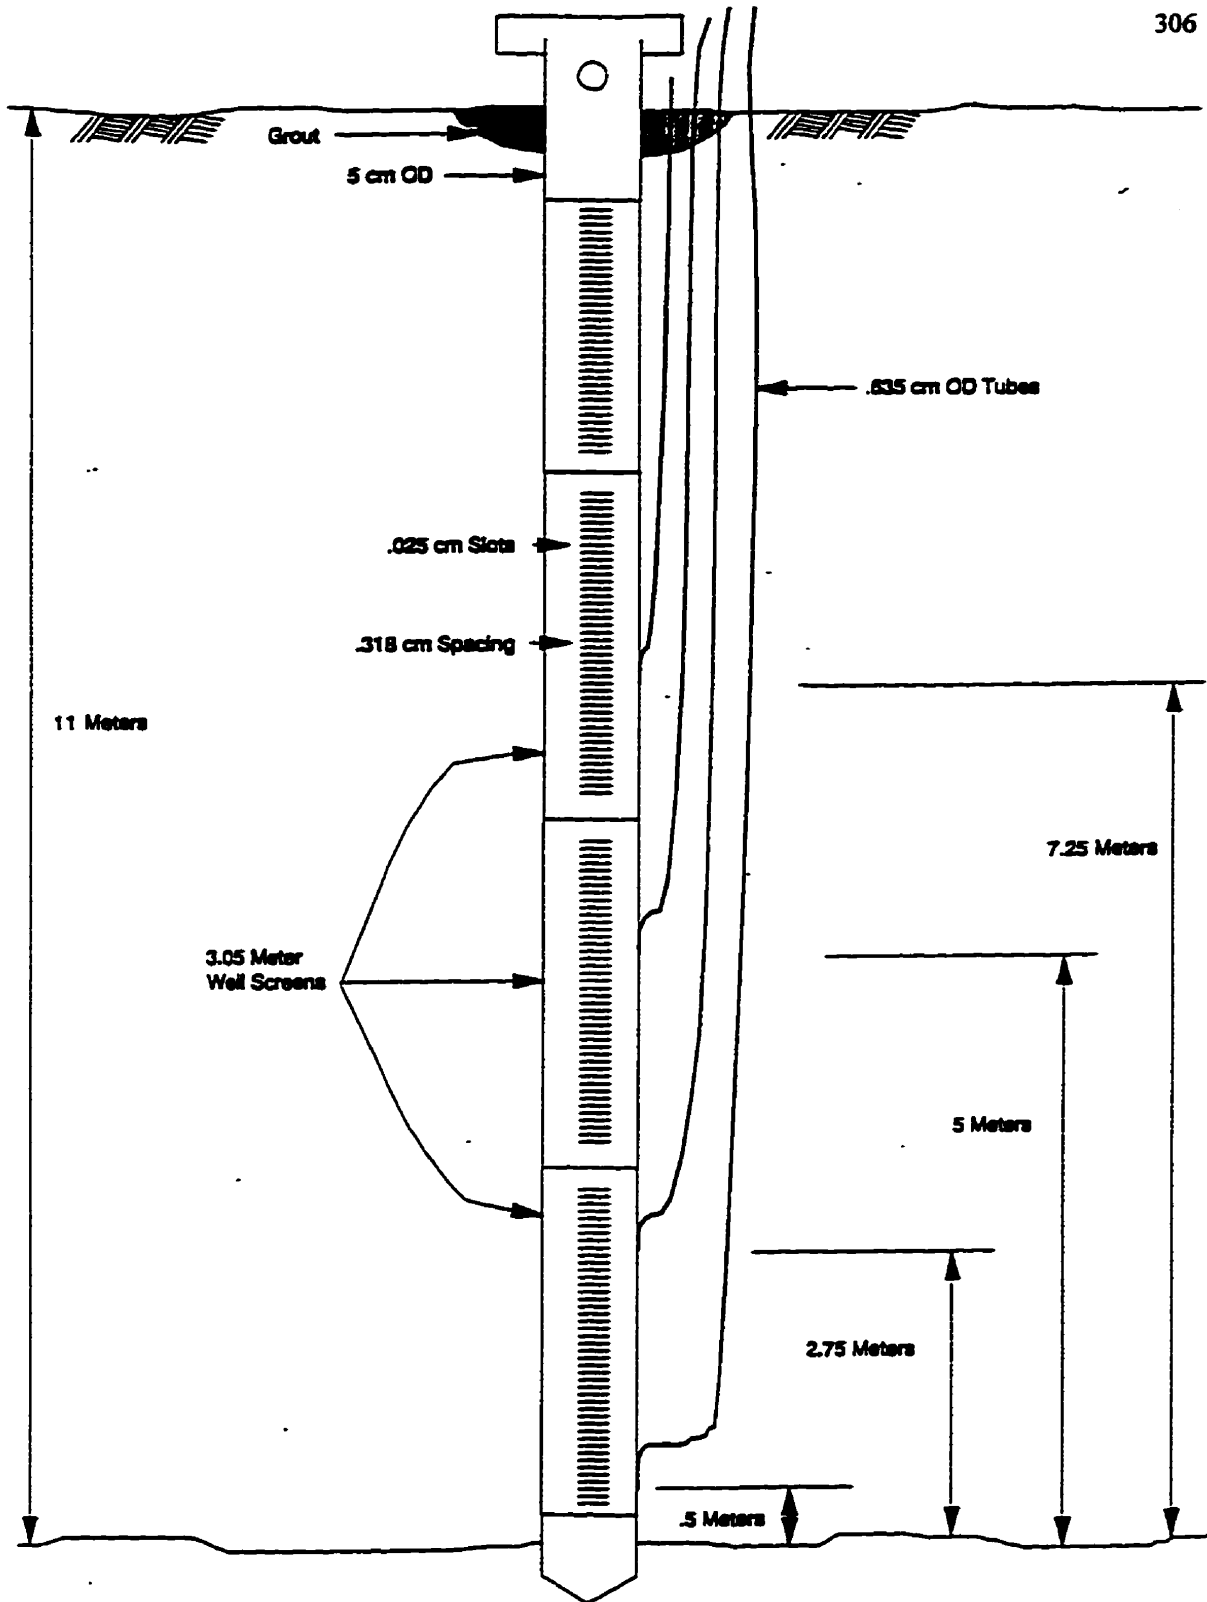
Example of a typical well installation at the 1-Ha test site.
